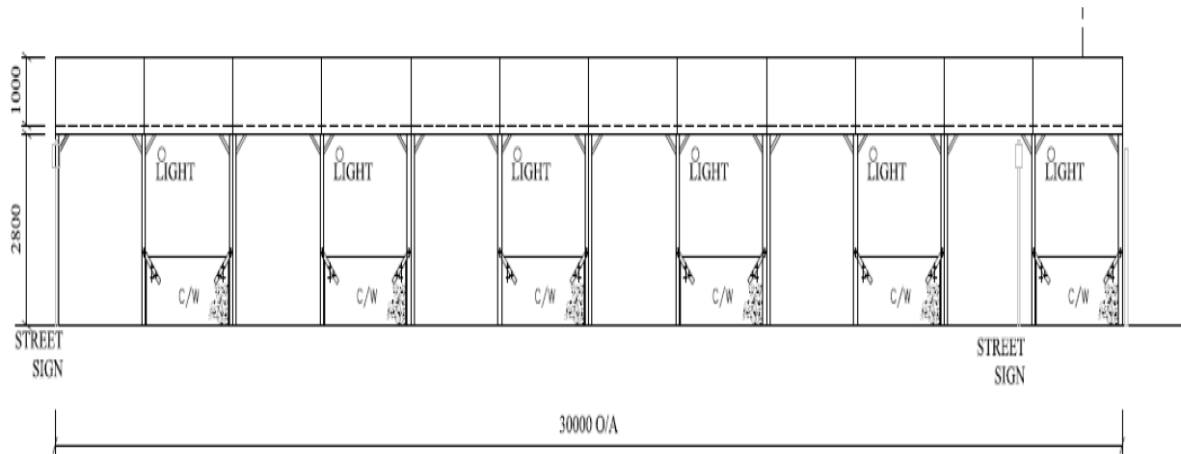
Diagram of typical Elevation Plan for Type B Hoarding. Representation of typical layout, indicative only
